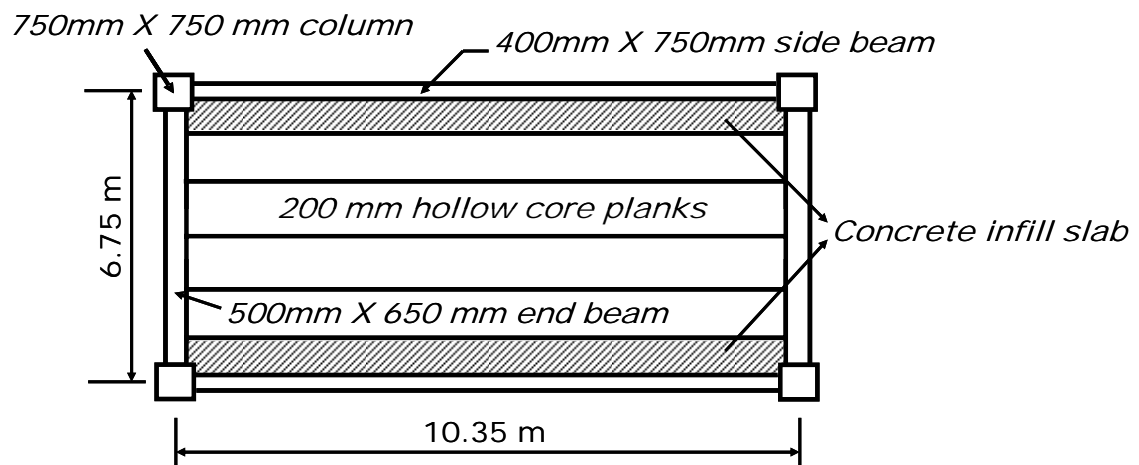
Plan view of one bay hollowcore flooring system with infill
